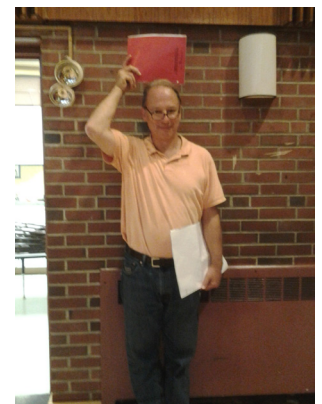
Cafetorium (cafeteria auditorium) emergency lighting installation
